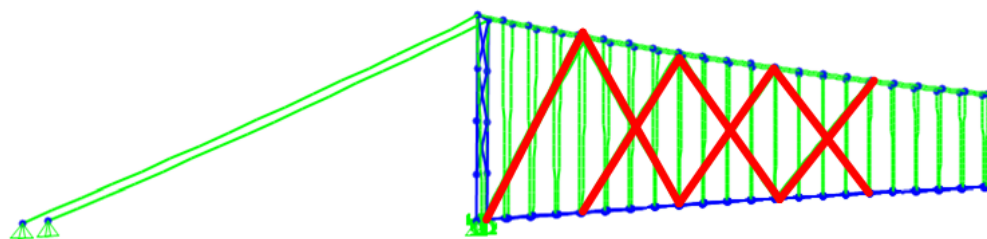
Vertical Bracing Pattern at Ends of 80 m Span Footbridge
